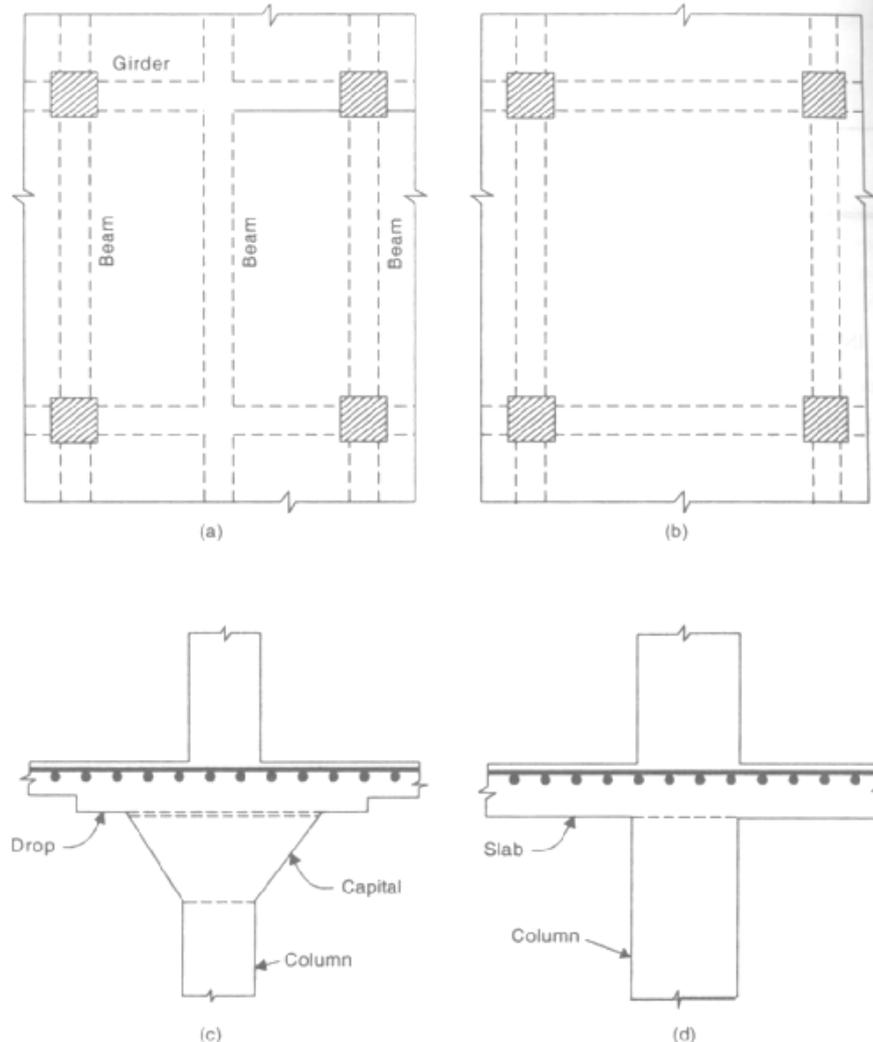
Types of reinforced concrete slabs; (a) one-way slab; (b) two-way slab; (c) Flat slab; (d) Flat plate.
